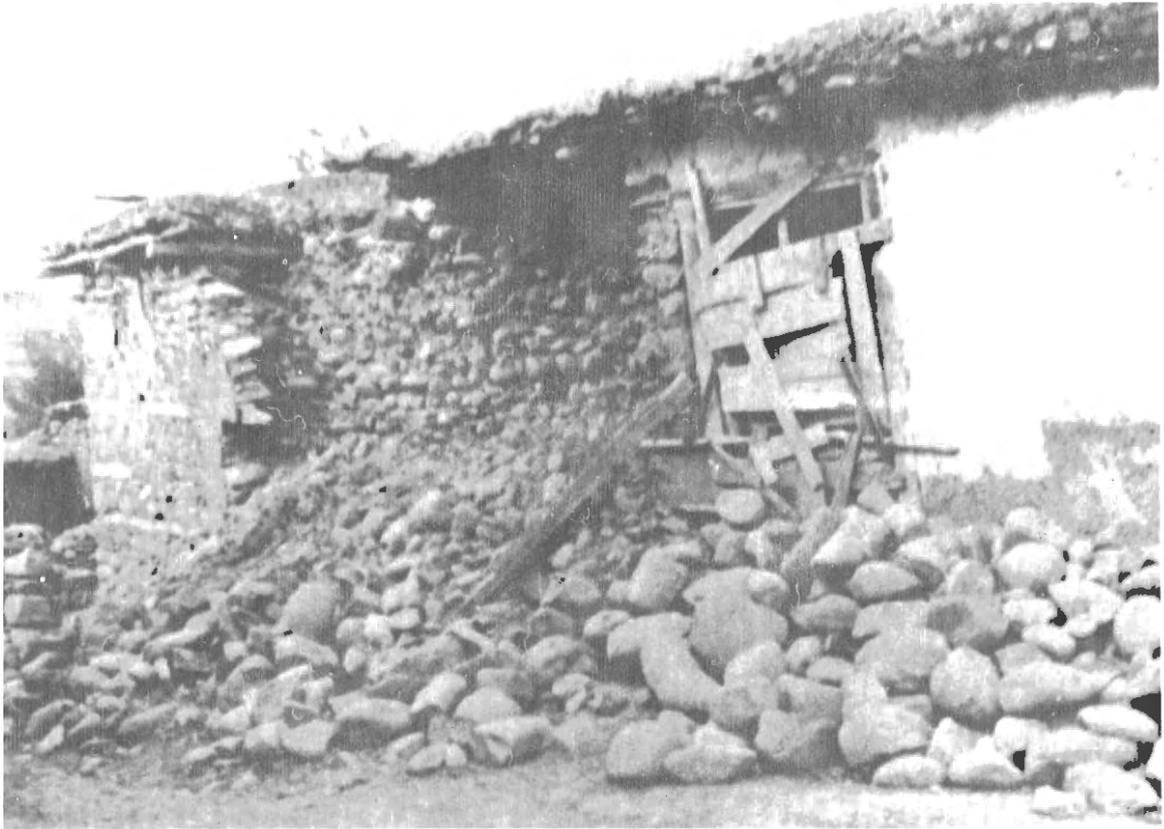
Field stone masonry house set in mud mortar, Turkey. Such construction is highly undesirable in earthquake-prone regions. Note, however, that wood ties have preserved the integrity of the wall at the corner. Field stone may be used in earthquake resistant construction provided that adequate tie-beams are used and that the mortar is of acceptable quality (see Figure 3.4).
